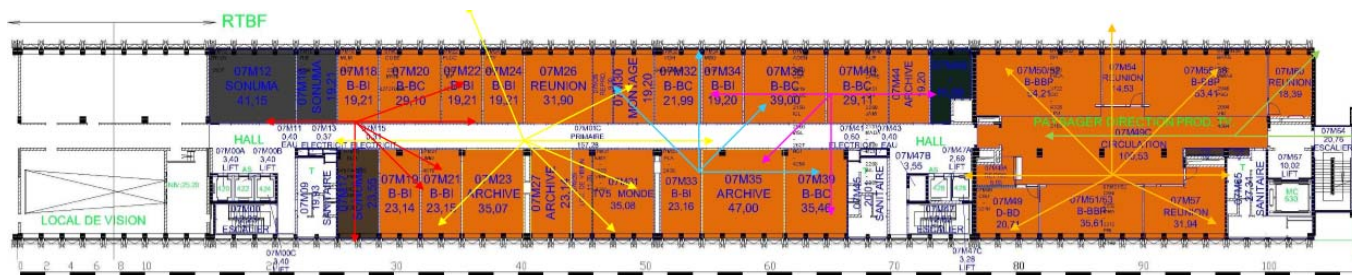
Design at 5 GHz for Floor 7 in Building CHJM
